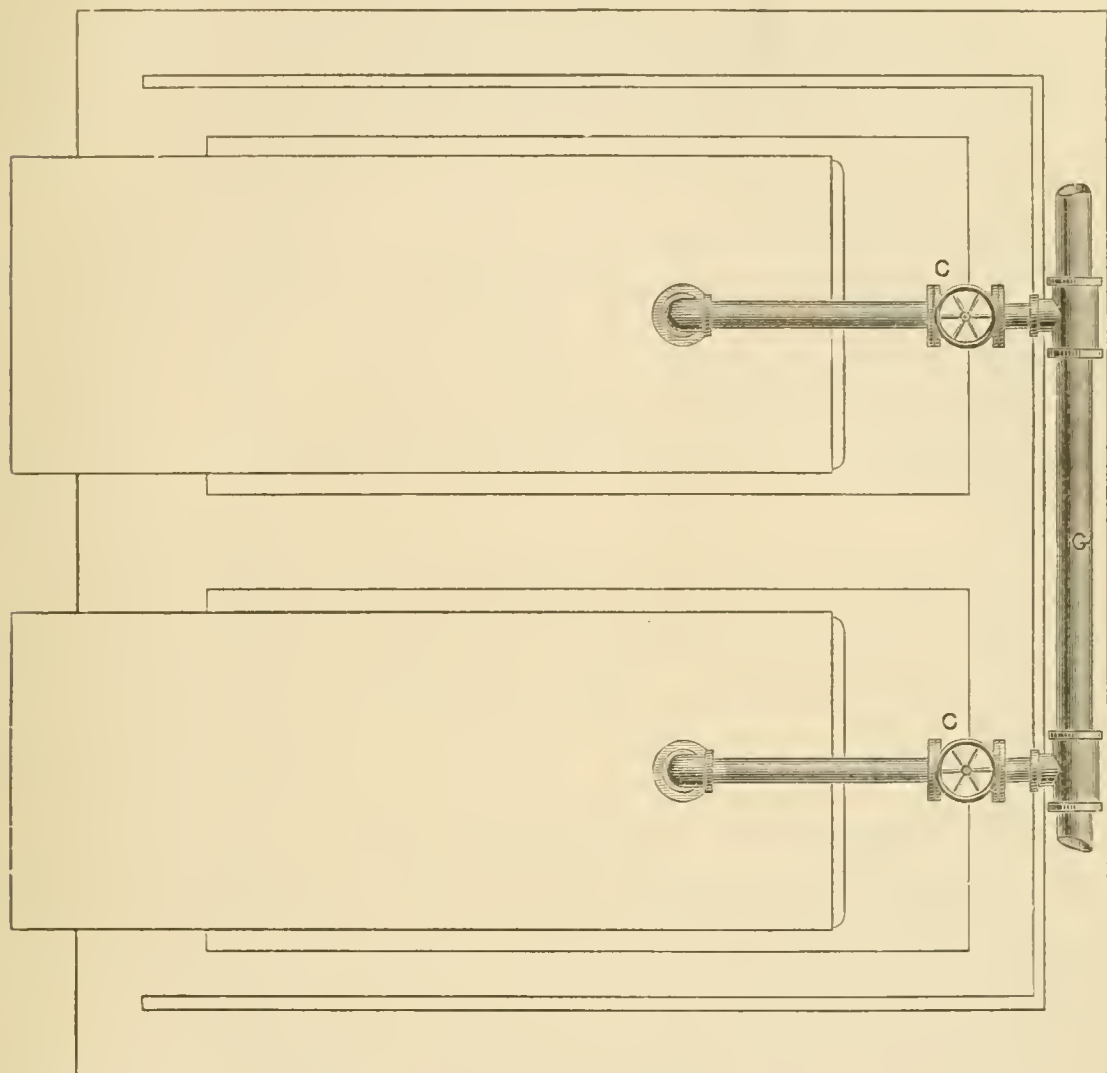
PLAN VIEW OF TWO BOILERS.
